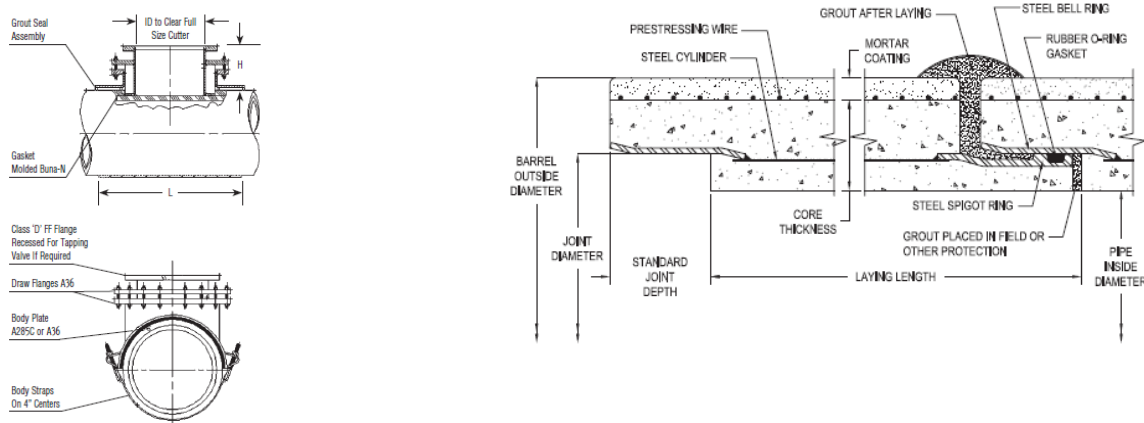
Concrete cylinder pipe tapping fitting Figure 9 Section concrete embedded cylinder pipe
